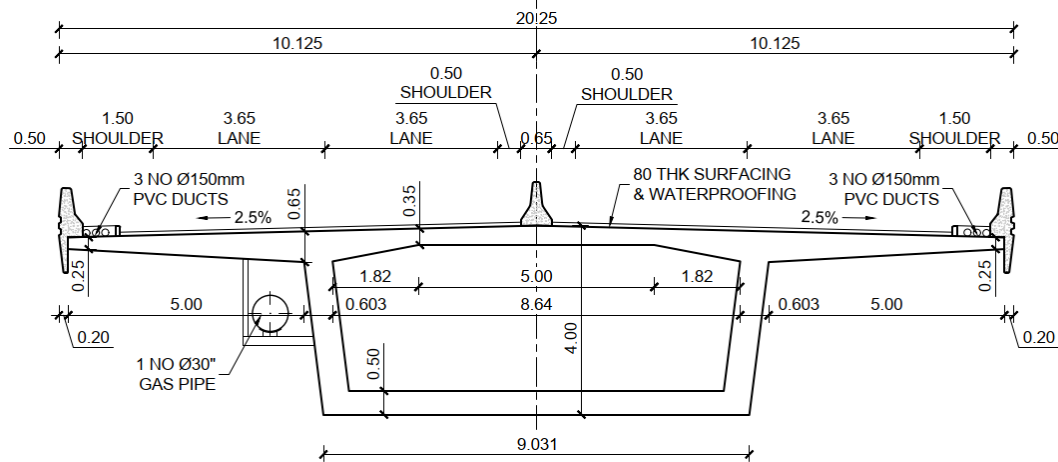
Image and typical cross section at mid-span (Main span) for Barishal-Bhola.
